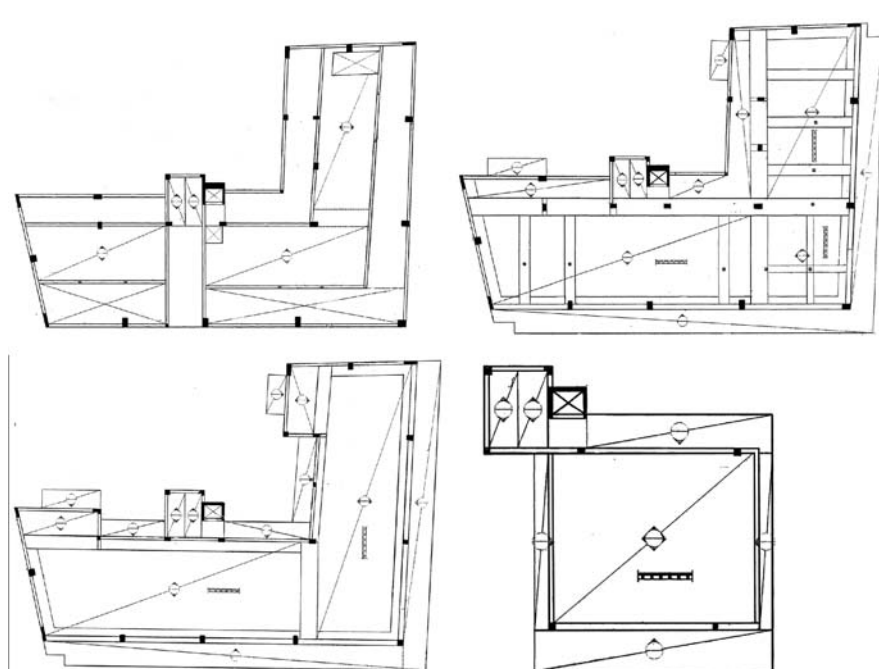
Framing plans of partially collapsed apartment building in Athens (1999) earthquake
